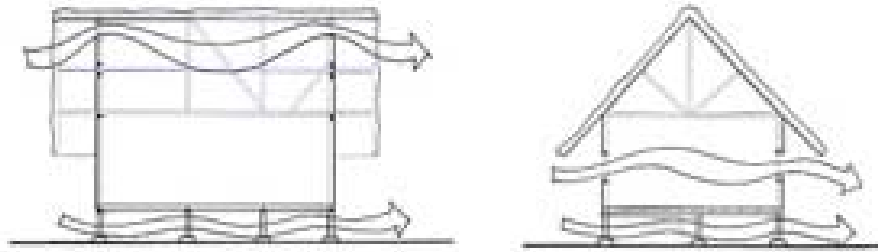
The air flow inside of building through roof, windows, wall, doors and also from under the floor
